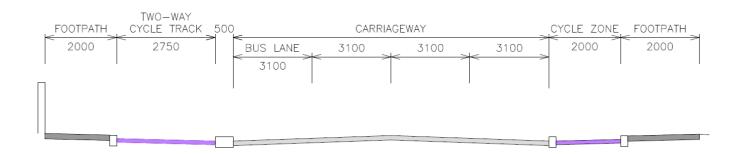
Typical Cross Section showing proposed footpath, cycle and road carriageway arrangement.
